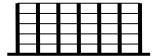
Frame system with a strong-column and weak-beam arrangement
